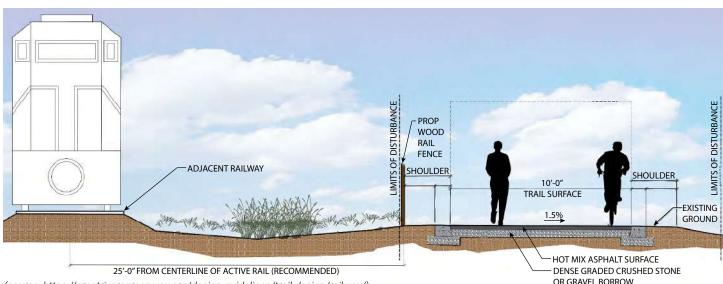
CONCEPTUAL MOUNT HOPE BAY RAIL-TRAIL SECTION (TOP RIGHT) FIGURE 18: TYPICAL RAIL-TRAIL SECTION
